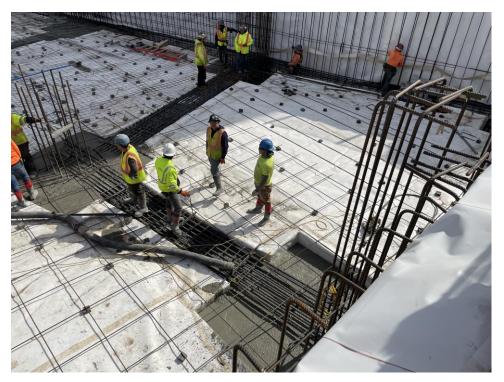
ECD pouring concrete for a pile cap in WCG COMP A (facing southeast).
